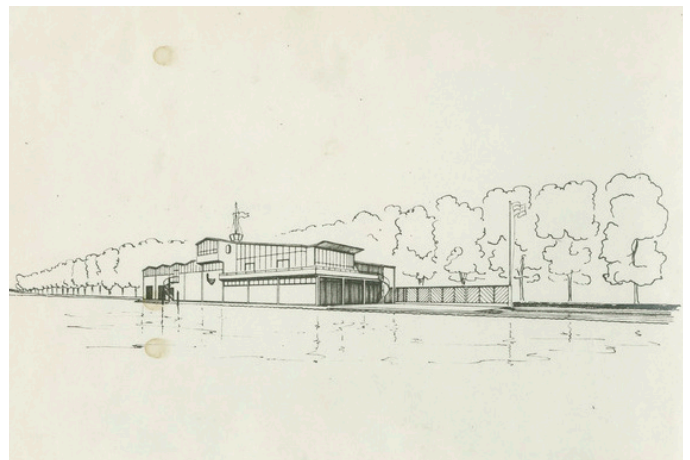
Perspective drawing from the Amstel River towards South-West facade
